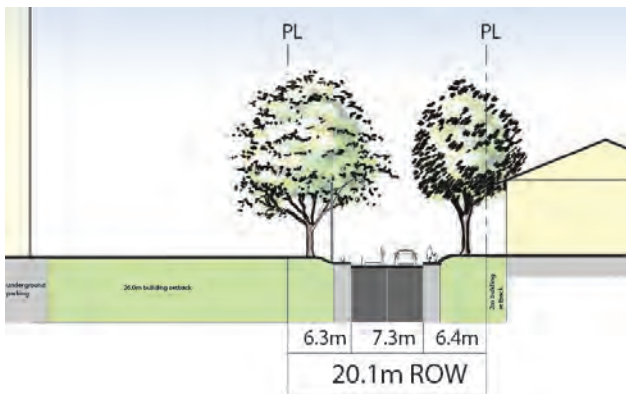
Glenlake Avenue, illustrative street cross-section diagram.
